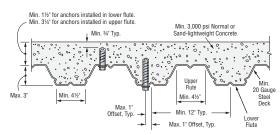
Installation of %" and ½" Diameter Anchors in the Soffit of Concrete over Metal Deck
